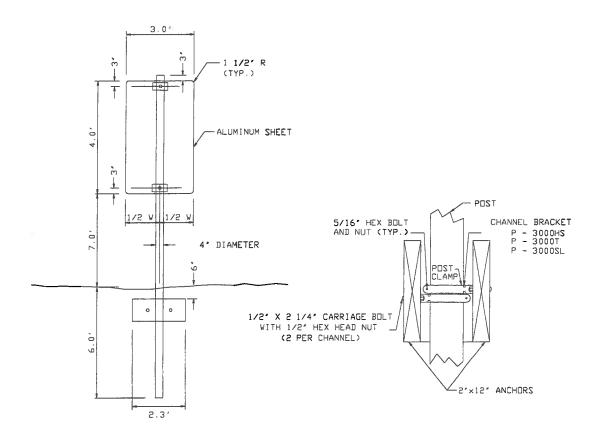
Elevation View of the Single Thin-Walled Aluminum Support Sign Installation.
